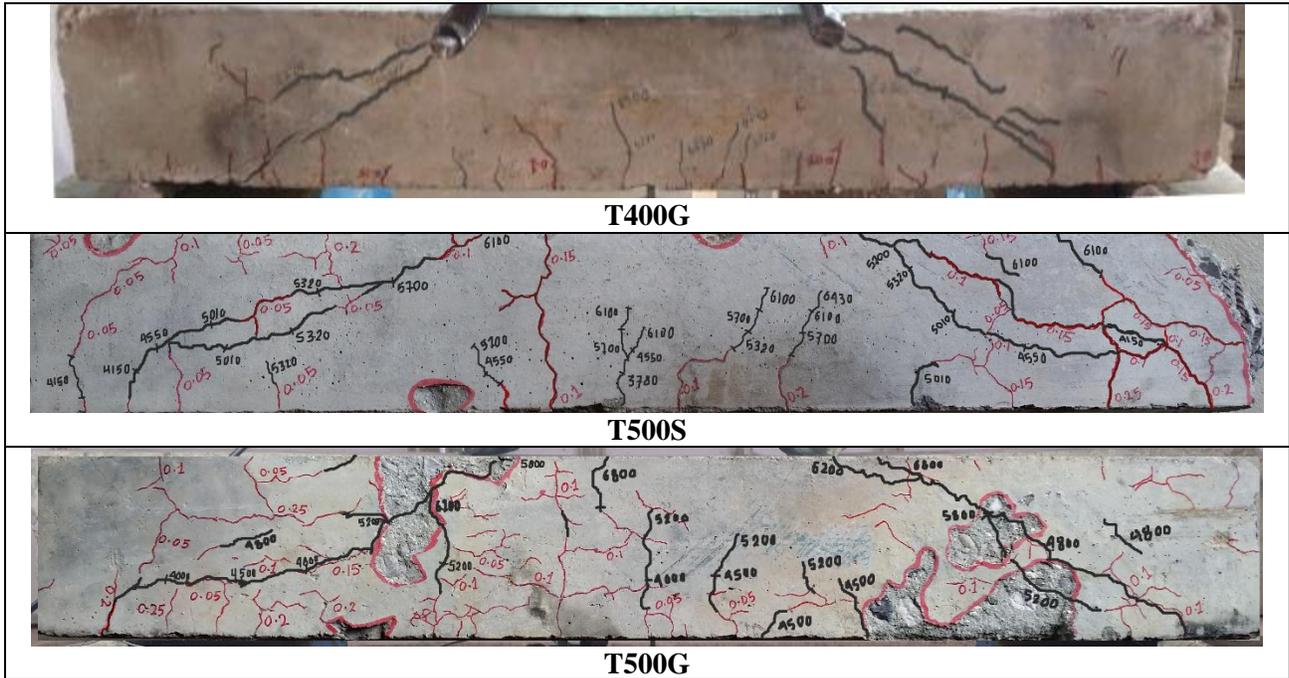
Crack pattern of specimens after repeated – load test (Continue).
